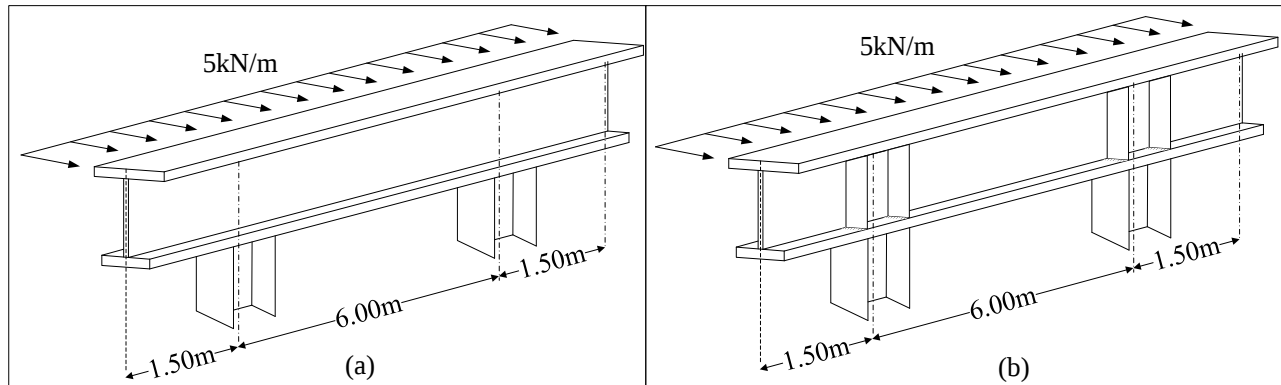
Multi-span beam, a) No Stiffeners provided b) Pair of stiffeners provided
